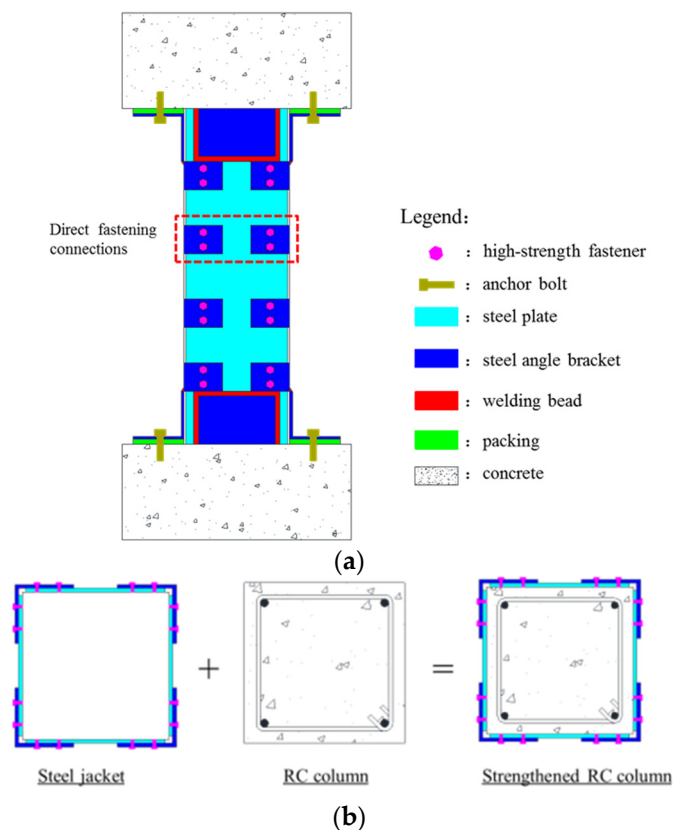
Proposed strengthening scheme: (a) front view; (b) plane view.
